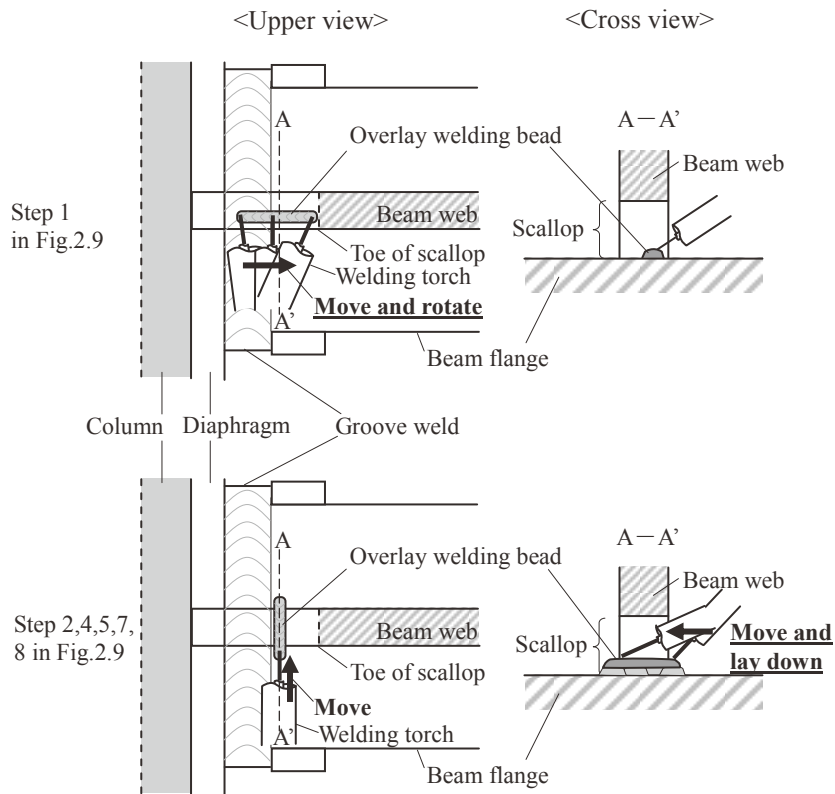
Schematic of welding torch movement in the scallop
